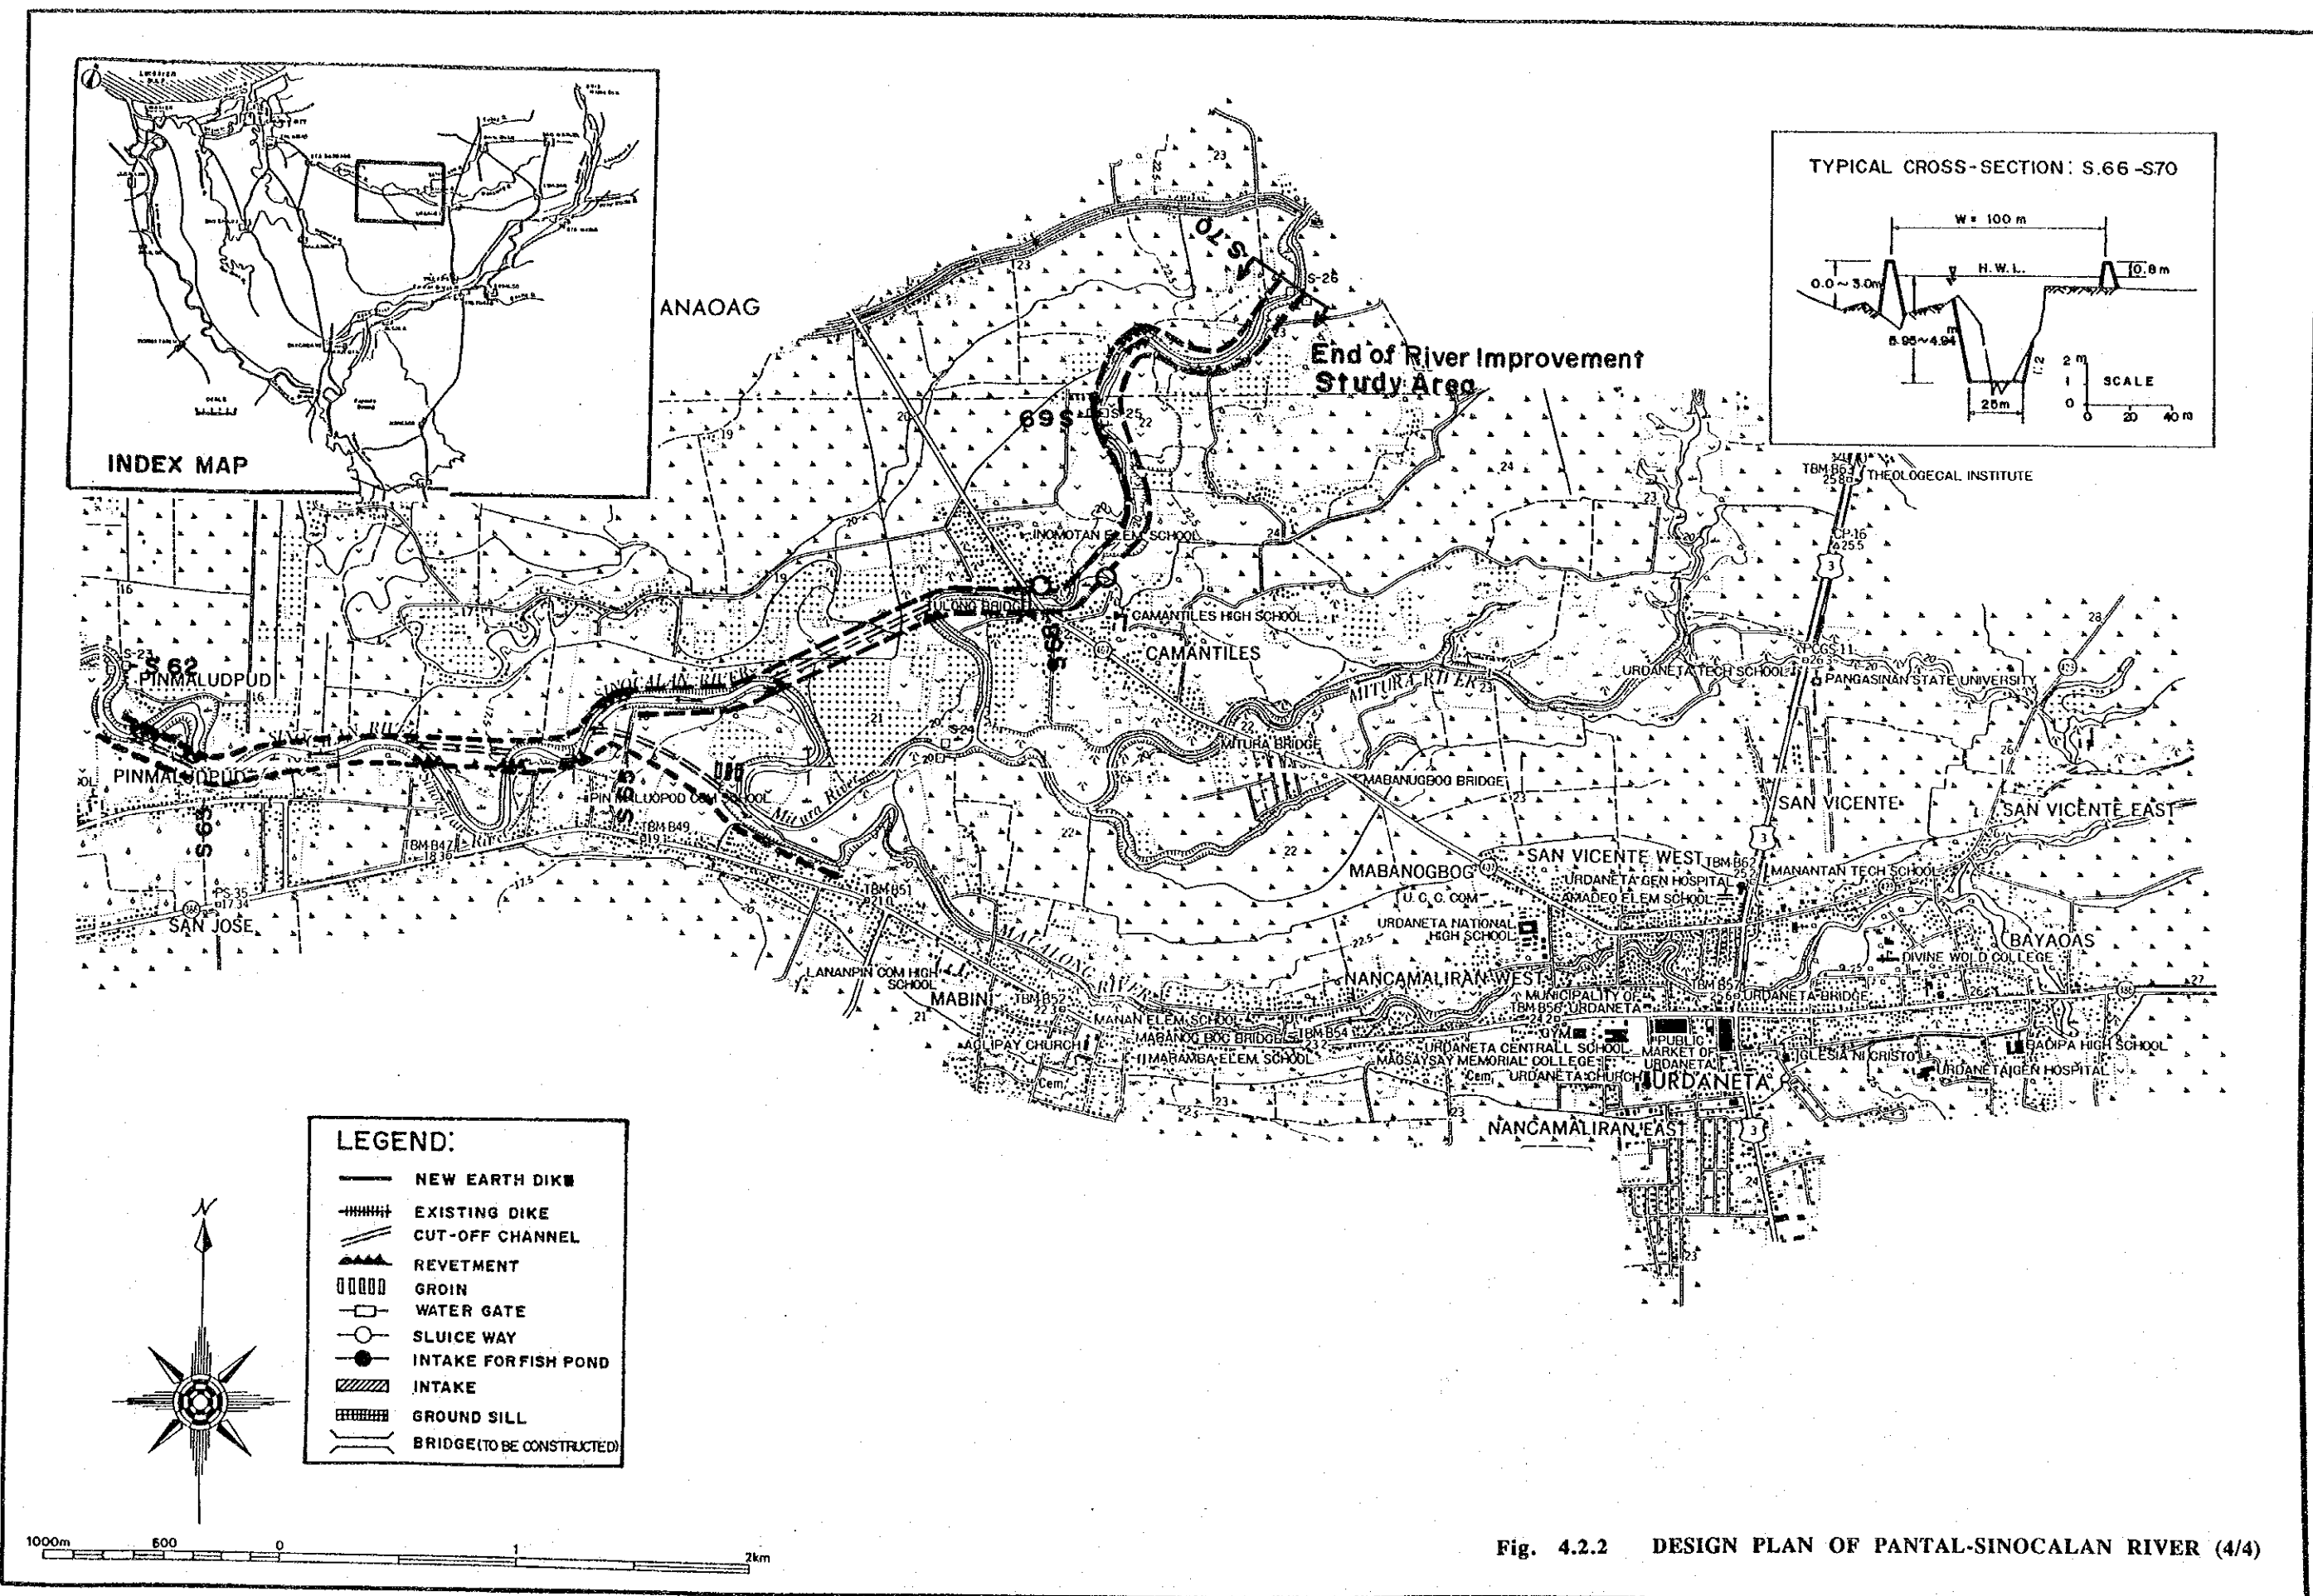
DESIGN PLAN OF PANTAL-SINOCALAN RIVER (4/4)
